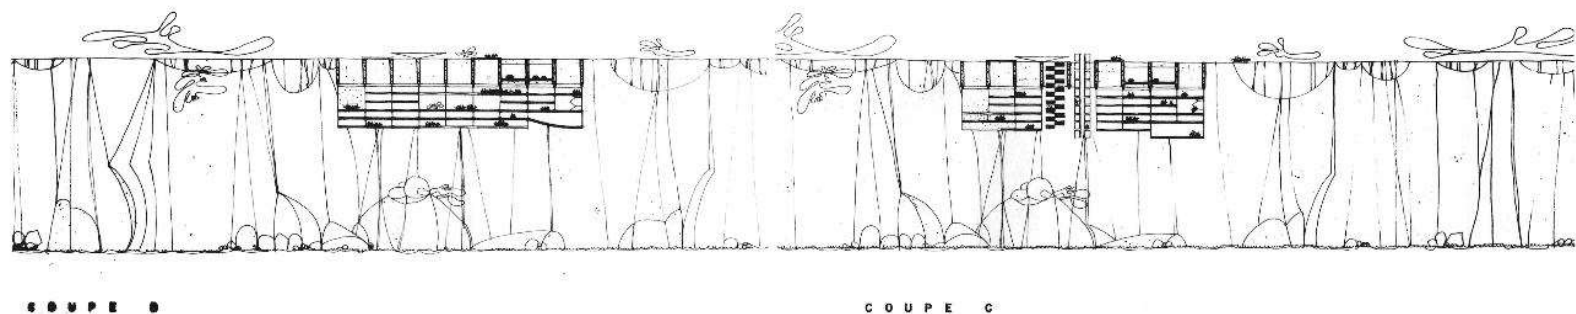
Ponte do Encontro, 1969, cross section. Silva, 2018, p. 162.
